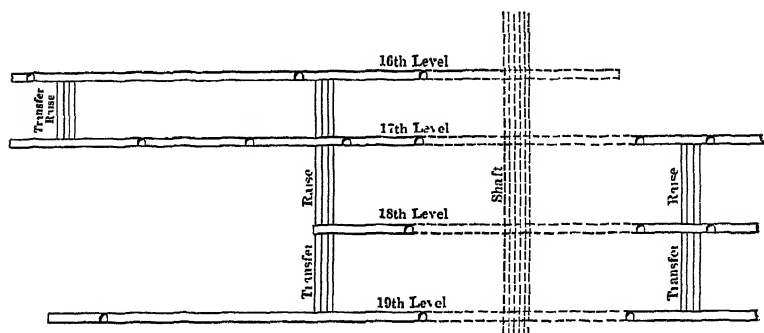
LONGITUDINAL SECTION THROUGH TRANSFER-RAISES.
